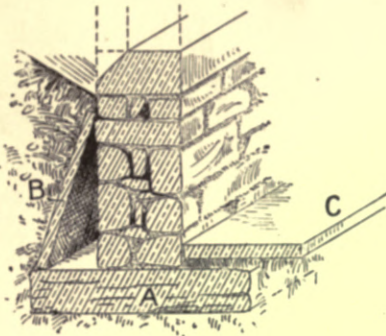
Bad Example of Stone Wall and Dry Area.
